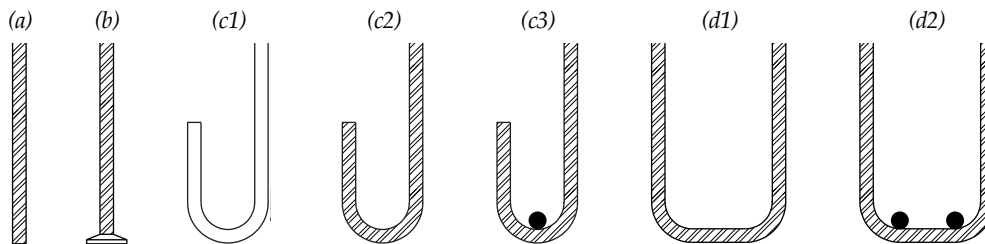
Types of reinforcement detailing solutions considered in the present research: (a) straight bars; (b) headed bars; (c) bend bar details; and (d) U-shaped bars
